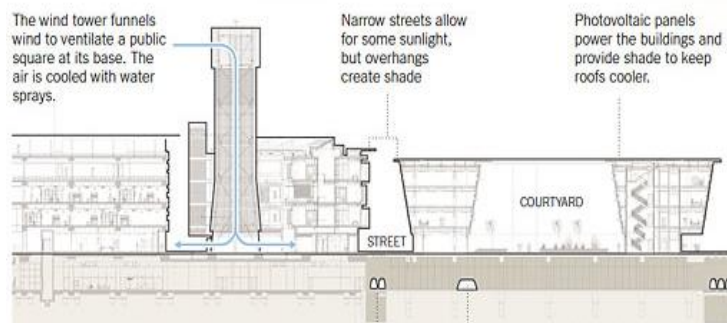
The wind tower, Narrow streets and photovoltaic panels [15]
